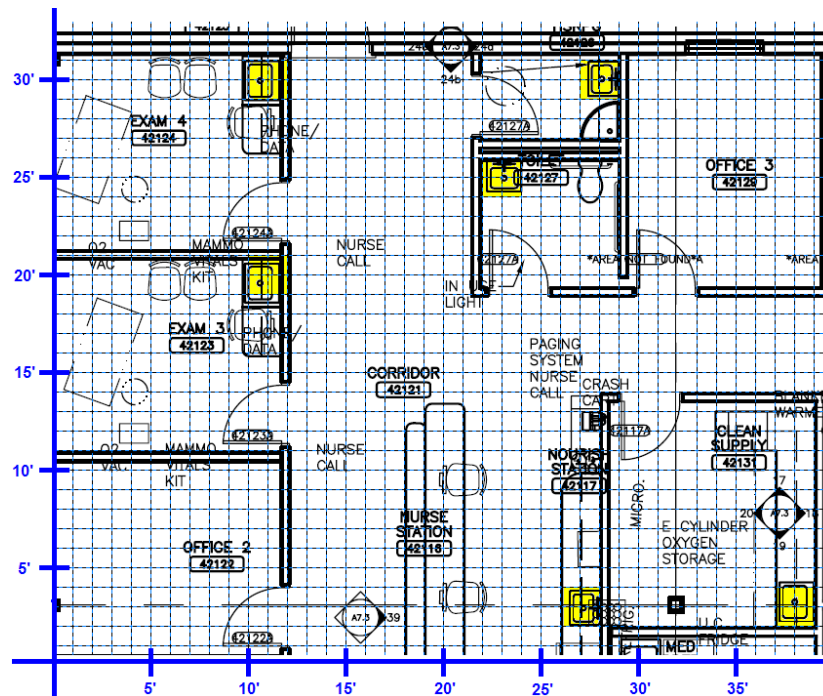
Floor Plan with Grid Overlay and Sink Highlighting
